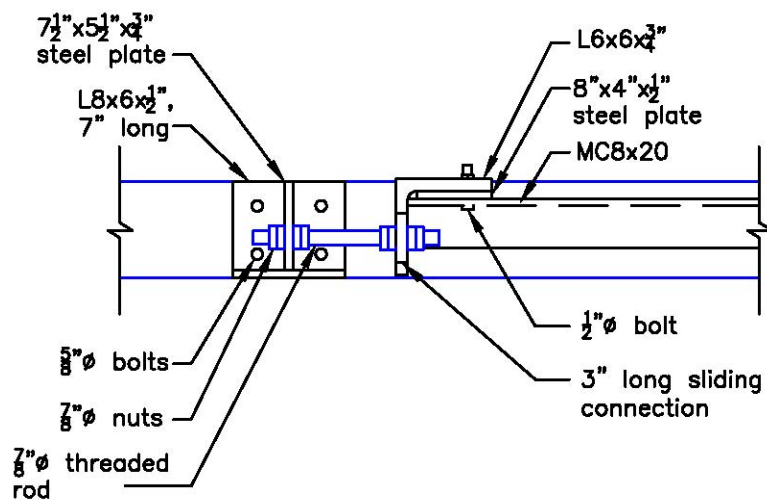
Load application detail along top sliding steel tube of racking facility
